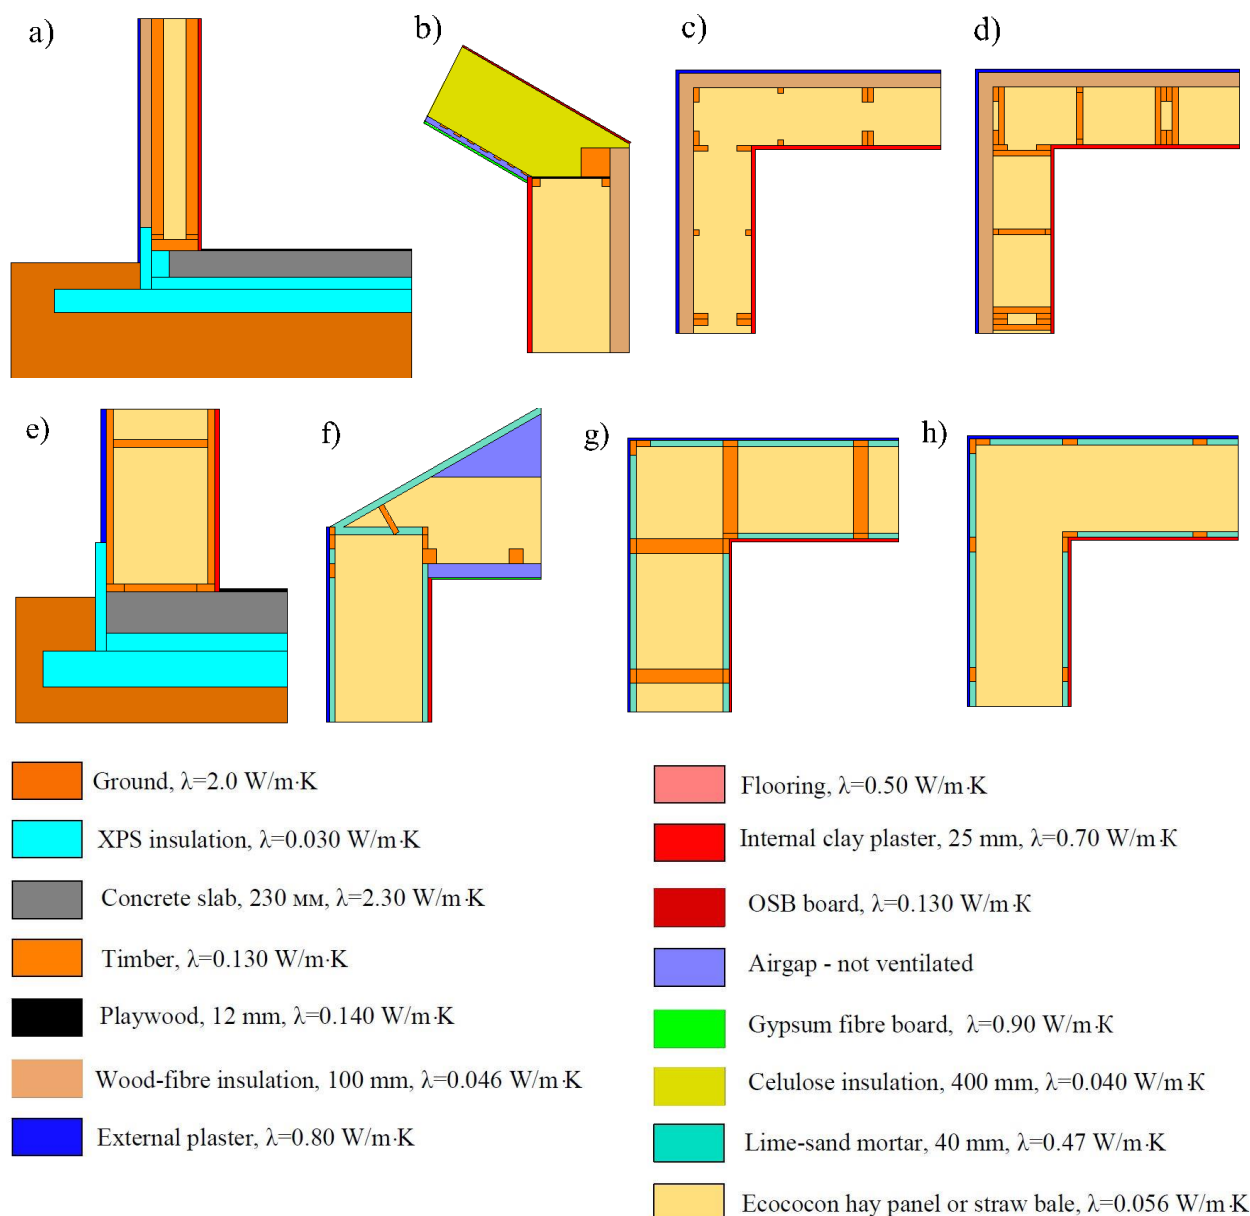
Straw bale wall modular system elements: bottom plate against exterior wall (a), eave (b), corner external (c,d) and the “GREB” straw bale technique elements: bottom plate against exterior wall (e), eave (f) and external corner (g,h)
